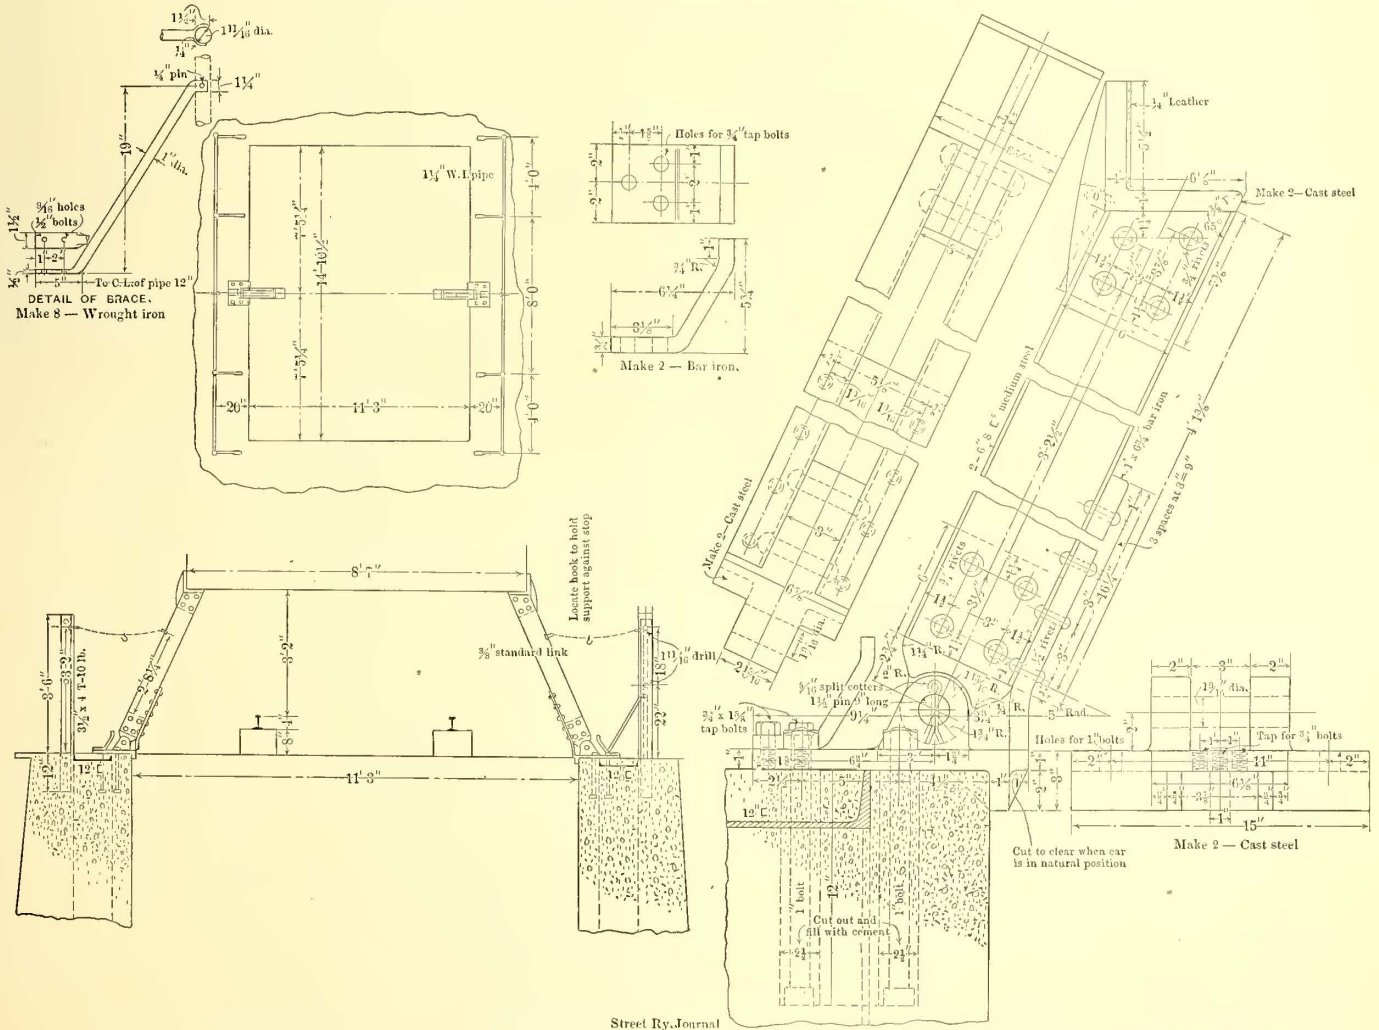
CONSTRUCTION DETAILS OF THE STEEL CAR SUPPORTS USED AT THE THIRTY-SIXTH STREET SHOP
